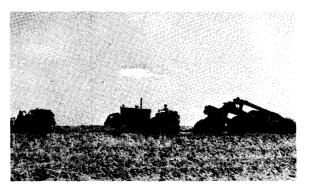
Spreading of untreated soil from the borrow area preparatory to constructing each new soil-cement layer, Bonny Test Section. Photo P331-700-31
